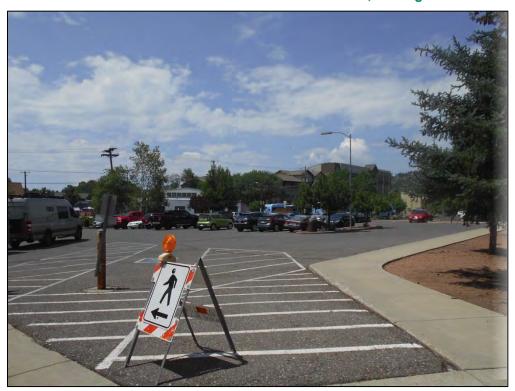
View from the west end of the Arizona Mineral Belt Railroad, looking southwest.
